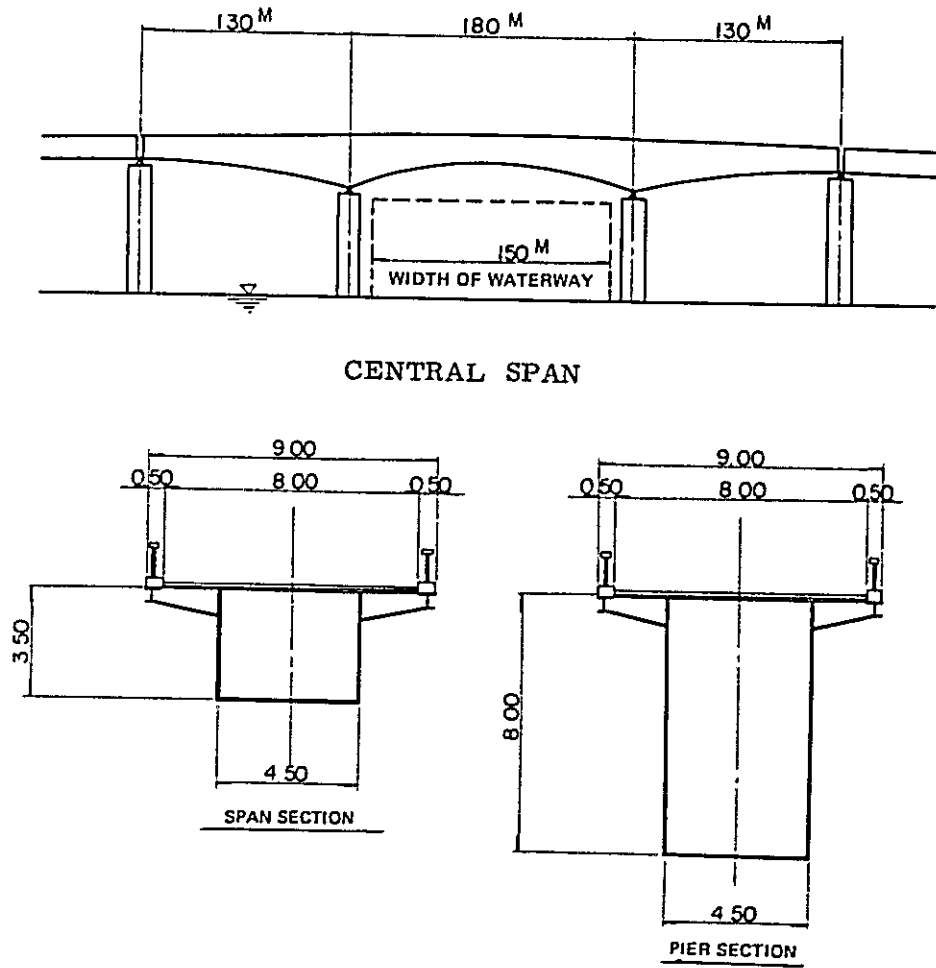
(1) SECTION OF 3-SPAN CONTINUOUS STEEL DECK BOX GIRDER
